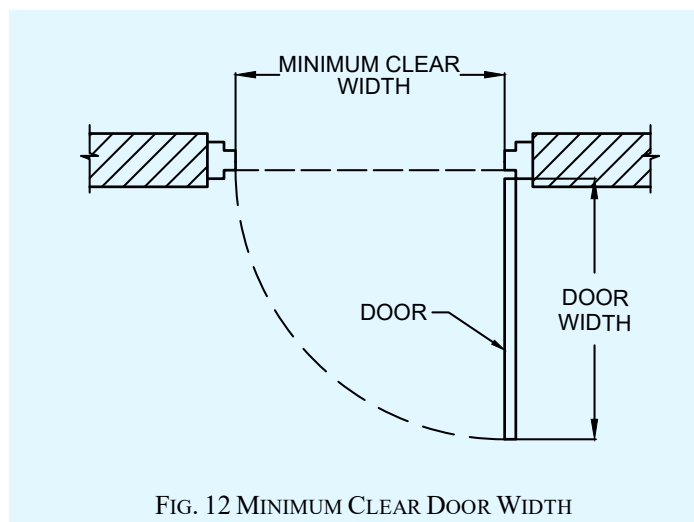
MINIMUM CLEAR DOOR WIDTH
